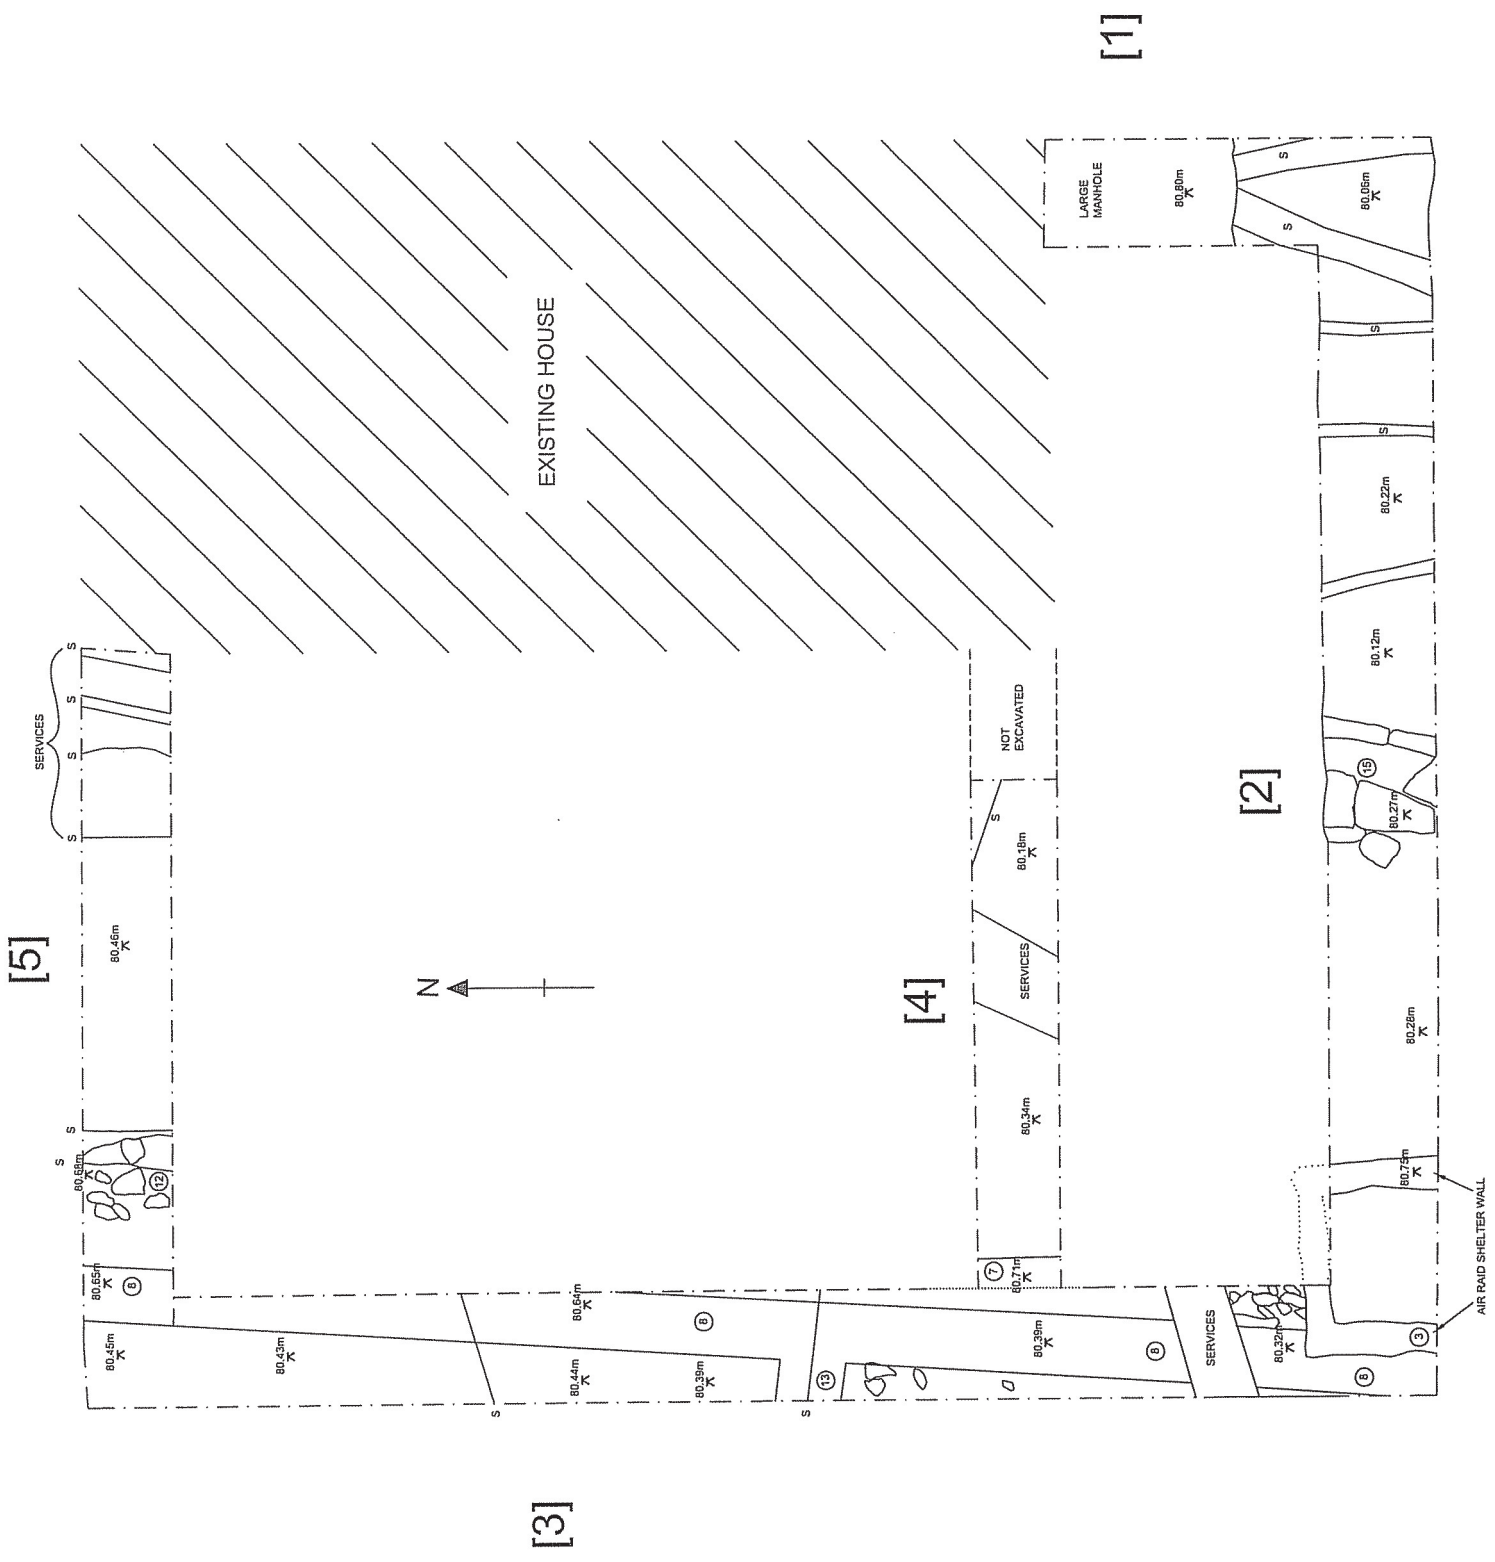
Location plan of excavated foundation trenches, subdivided into five areas (not to scale)
